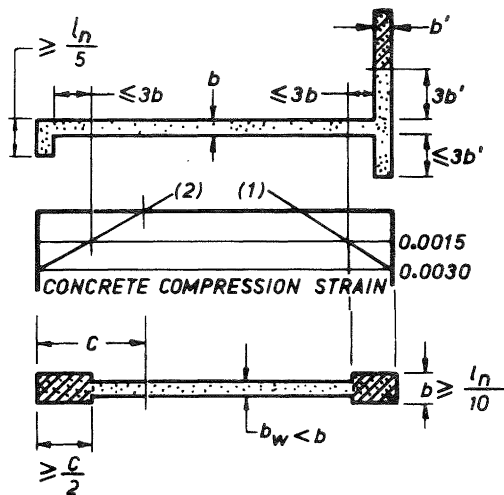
Parts of a Wall Section to be Considered for Instability and which Provides Lateral Support.
